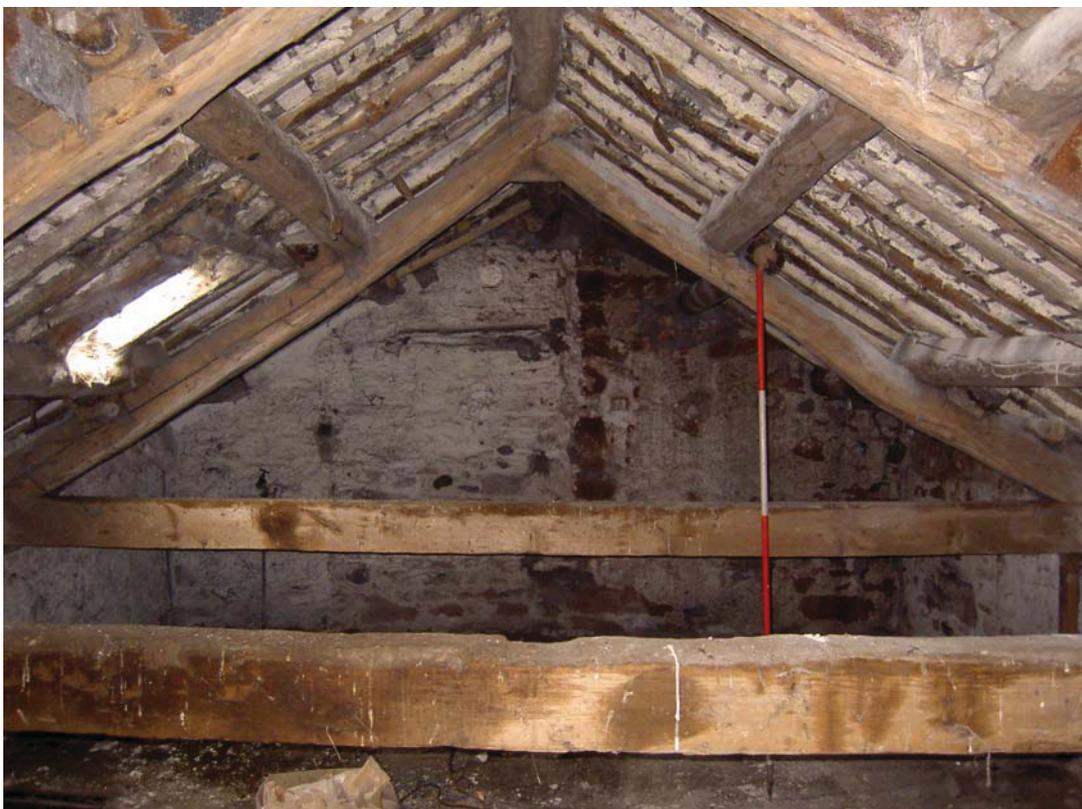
Detail of Building 5 roof structure and blocked window in west-north-west gable end of farmhouse
